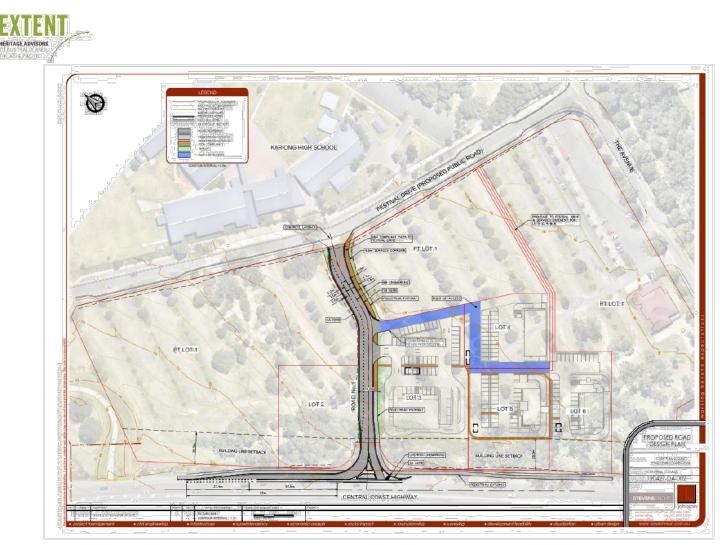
Proposed Road design Plan for the mid-block entry Point (source: ADW Johnson, Proposed Road Design Plan, Drawing No.190427-DA-002).
